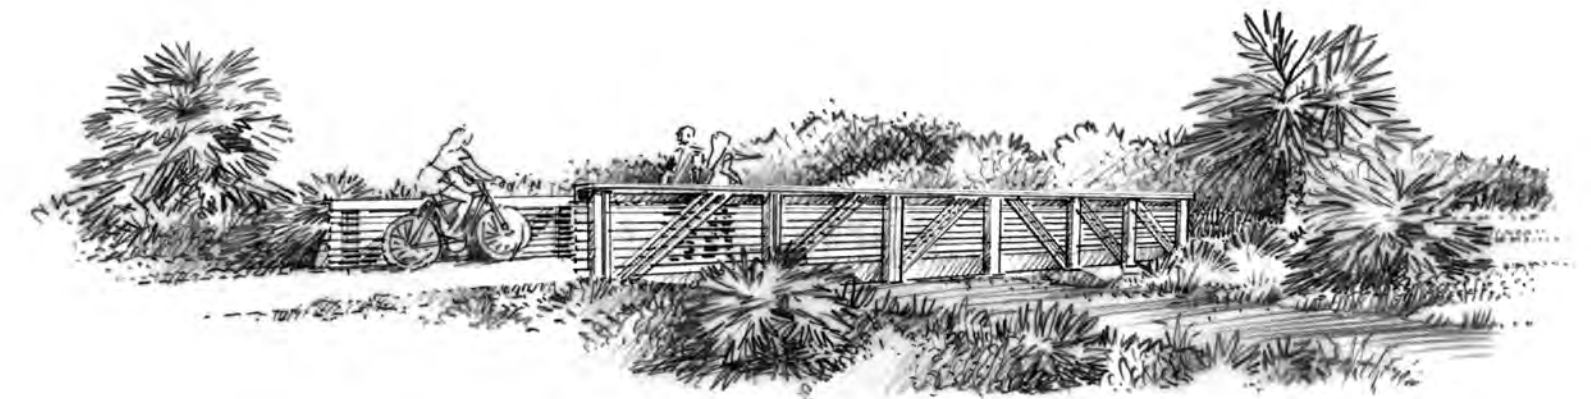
PEDESTRIAN BRIDGE OVER DRAINAGE AREA
